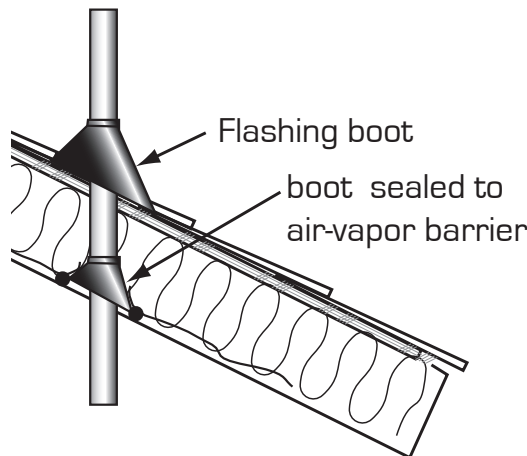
Detail of a plumbing stack in a cathedral roof
